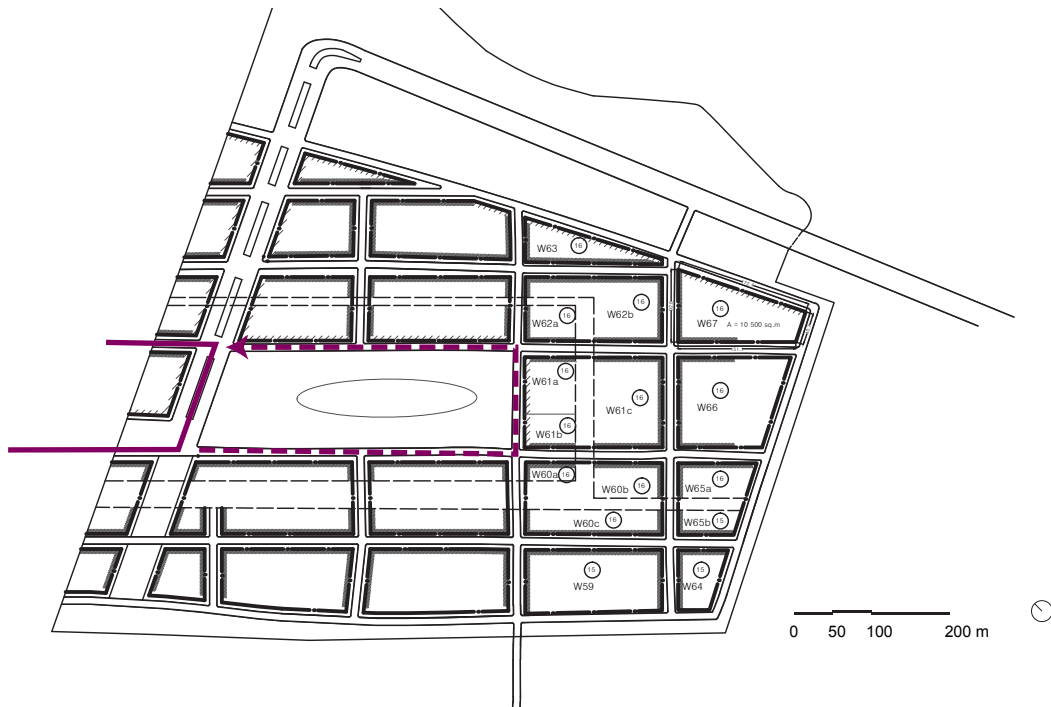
Extension of the tram to go further into the site around Van Gough Park to provide access to downtown Amsterdam
